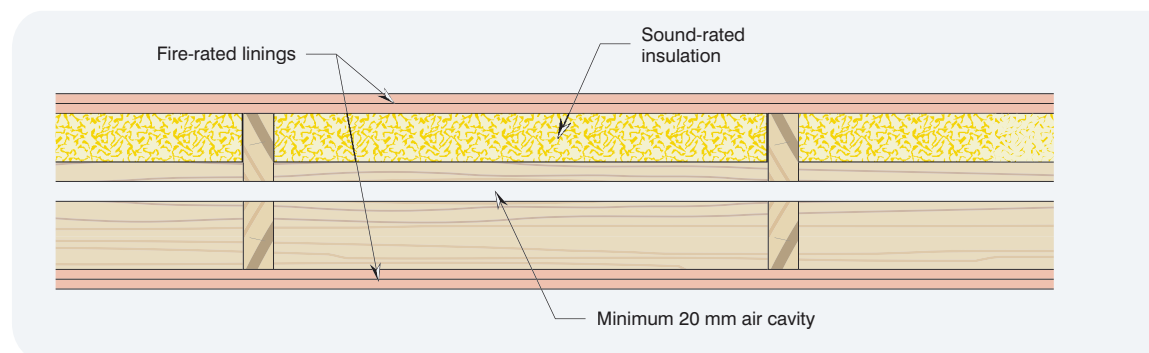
Fire- and sound-rated double stud timber wall – plan view.
